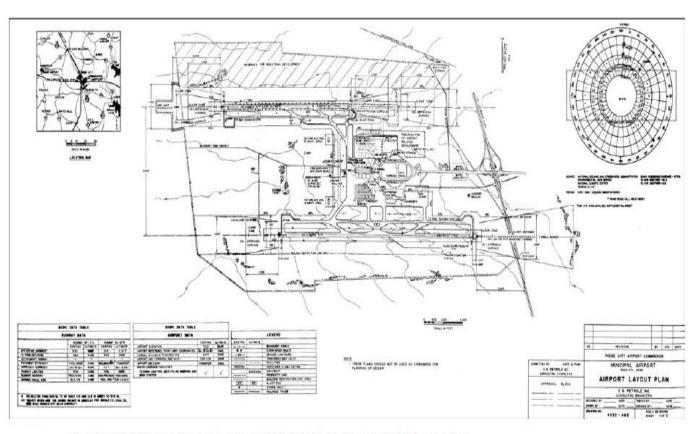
Sample airport layout plan. (From FAA, Airport Master Plans, Advisory Circular AC150/5070-6A, 1985.)
